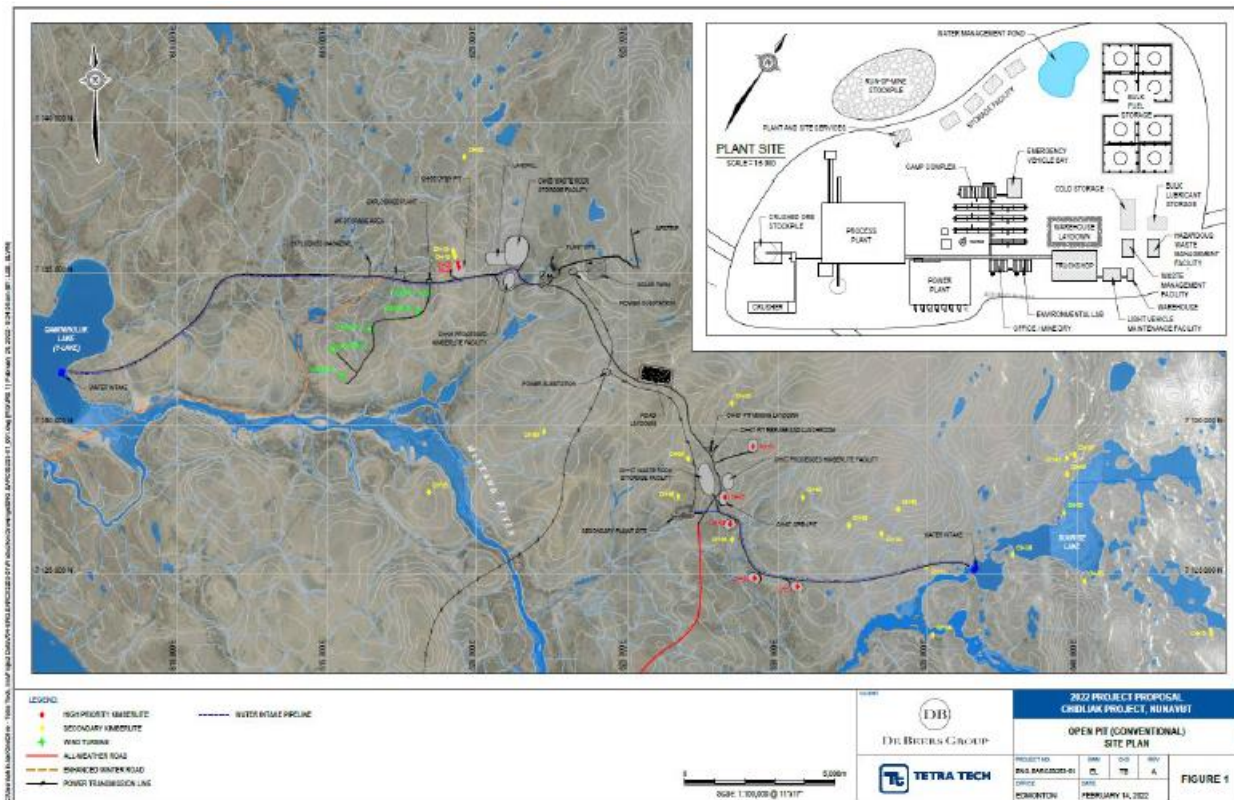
Conceptual Layout Project Infrastructure with the Open Pit Mining Method
